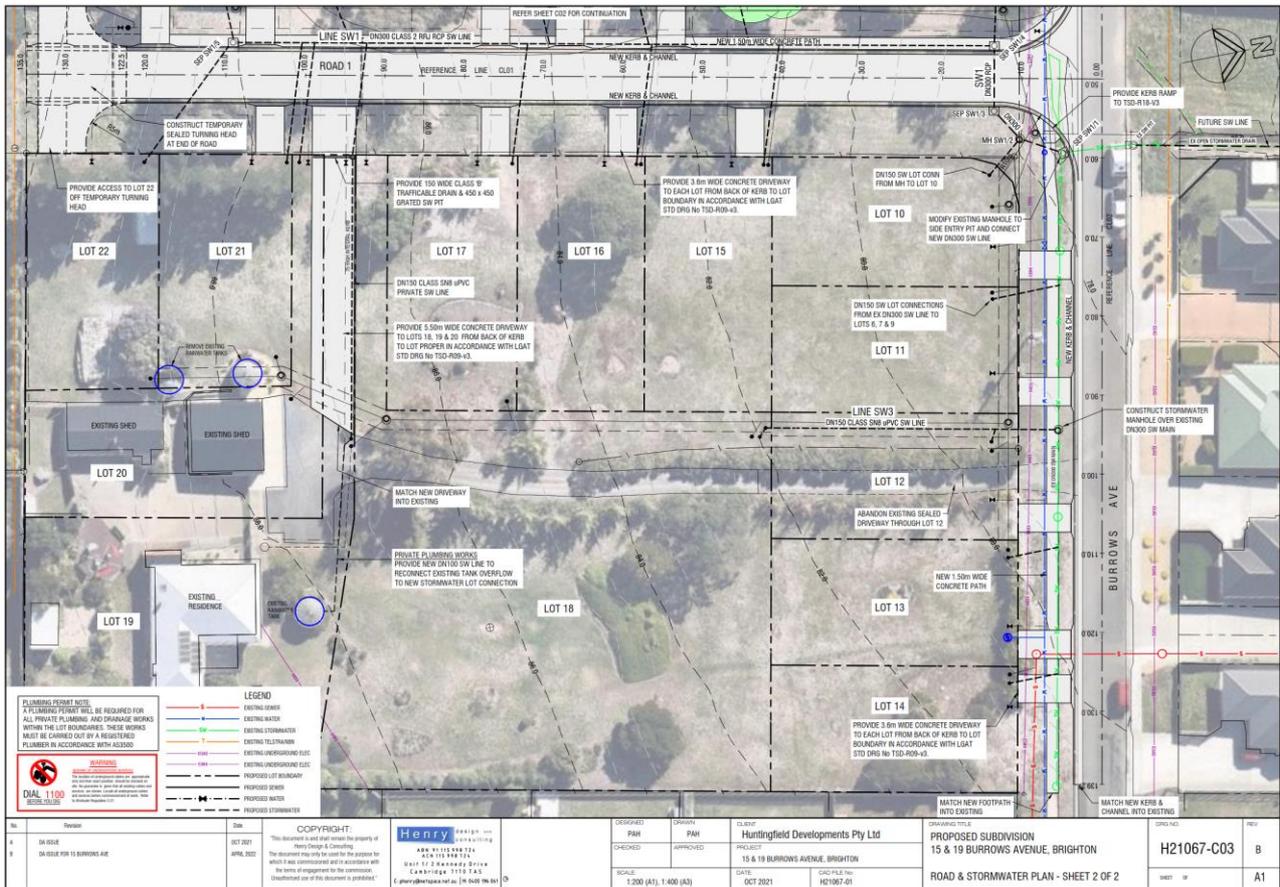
Henry Design & Consulting general arrangement plan (10/21)
